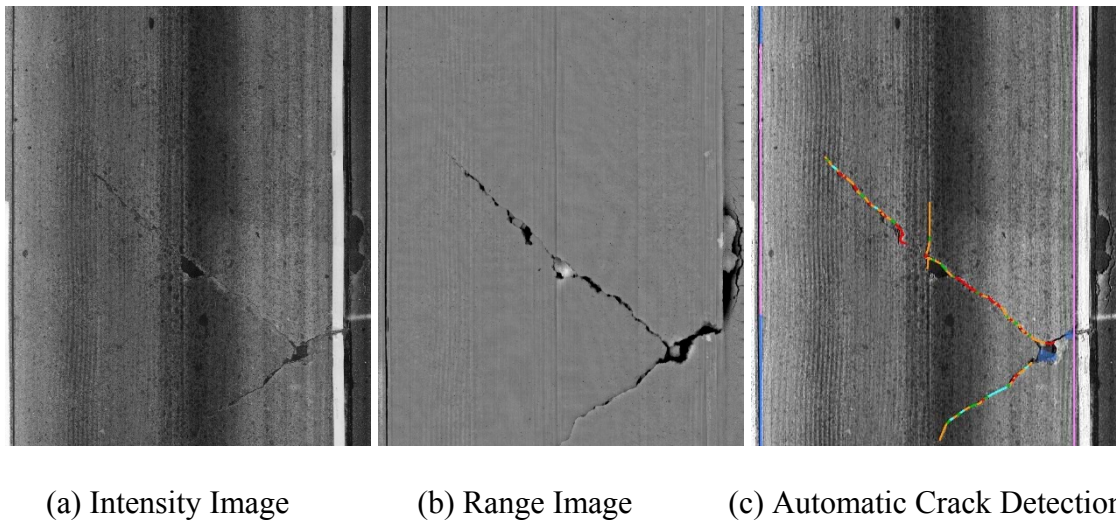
Crack detection on slab #C1' on I-16 test site (Score: 85.4087)
